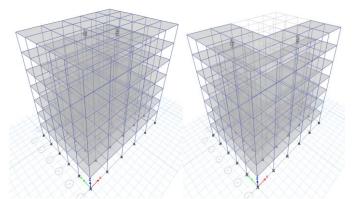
3d plan of regular and L-shape building provided with dampers respectively.
